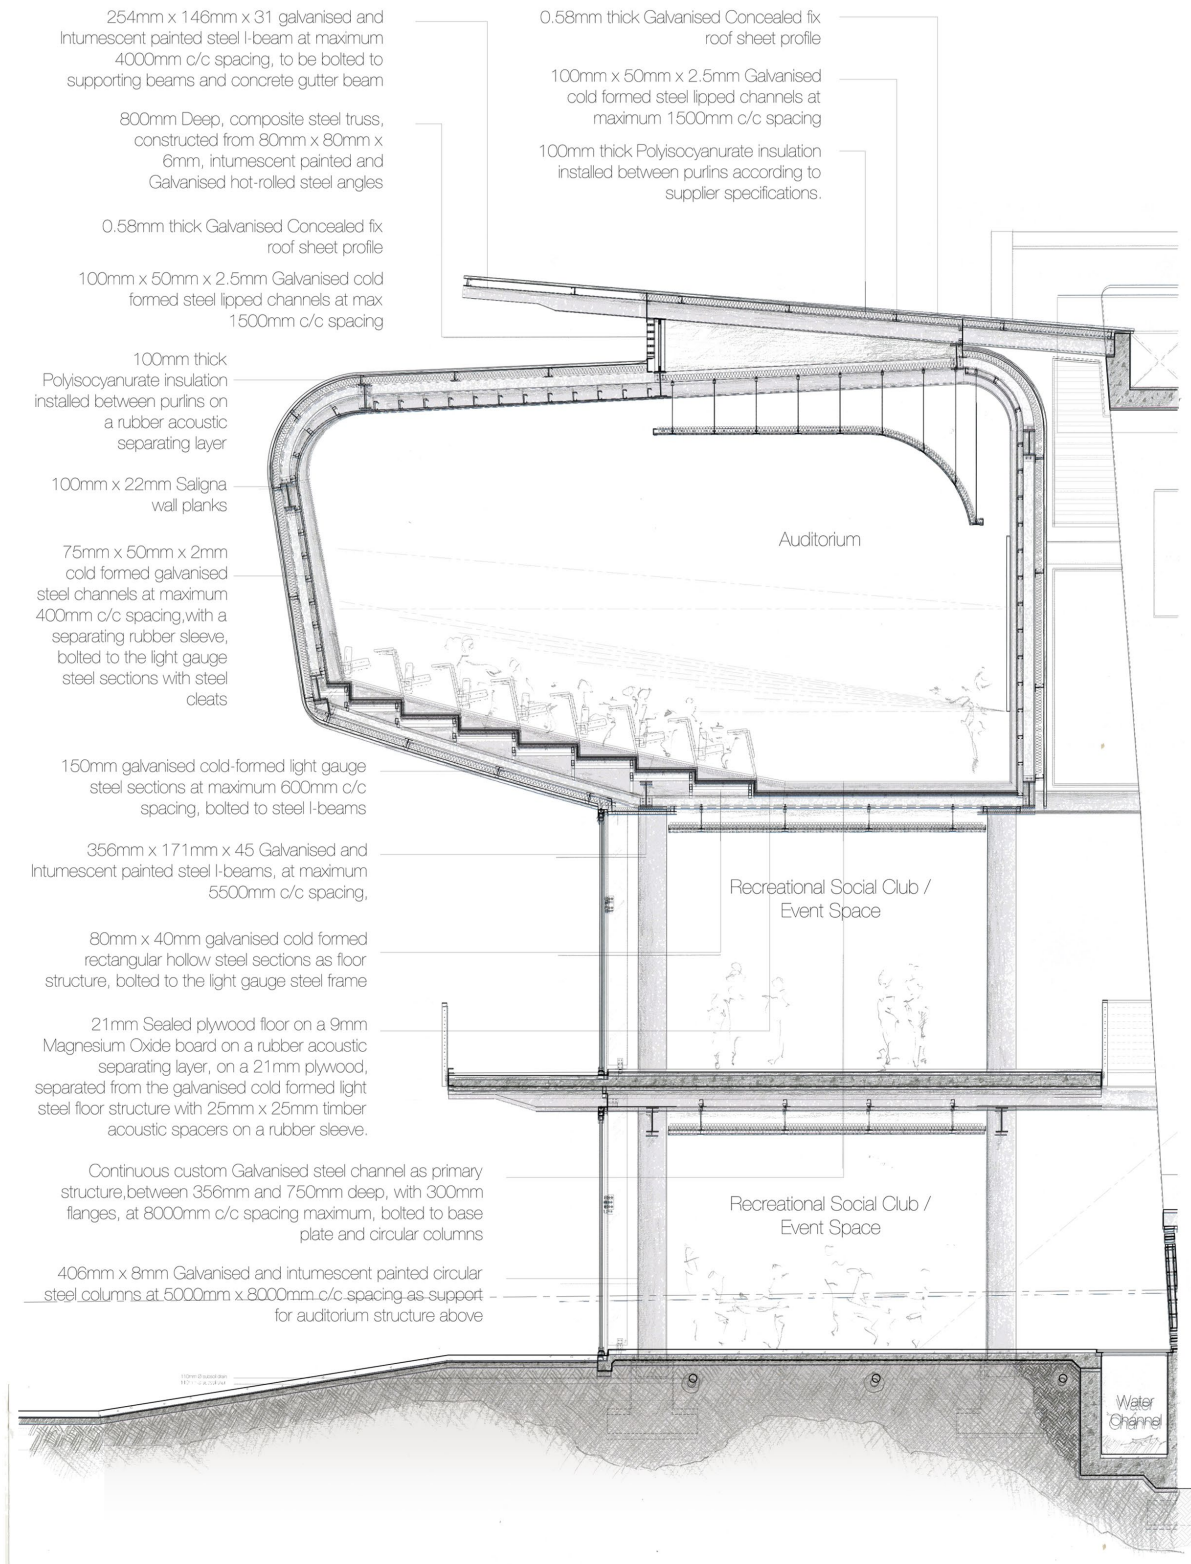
Detailed section of the auditorium structure. (Author 2015)
